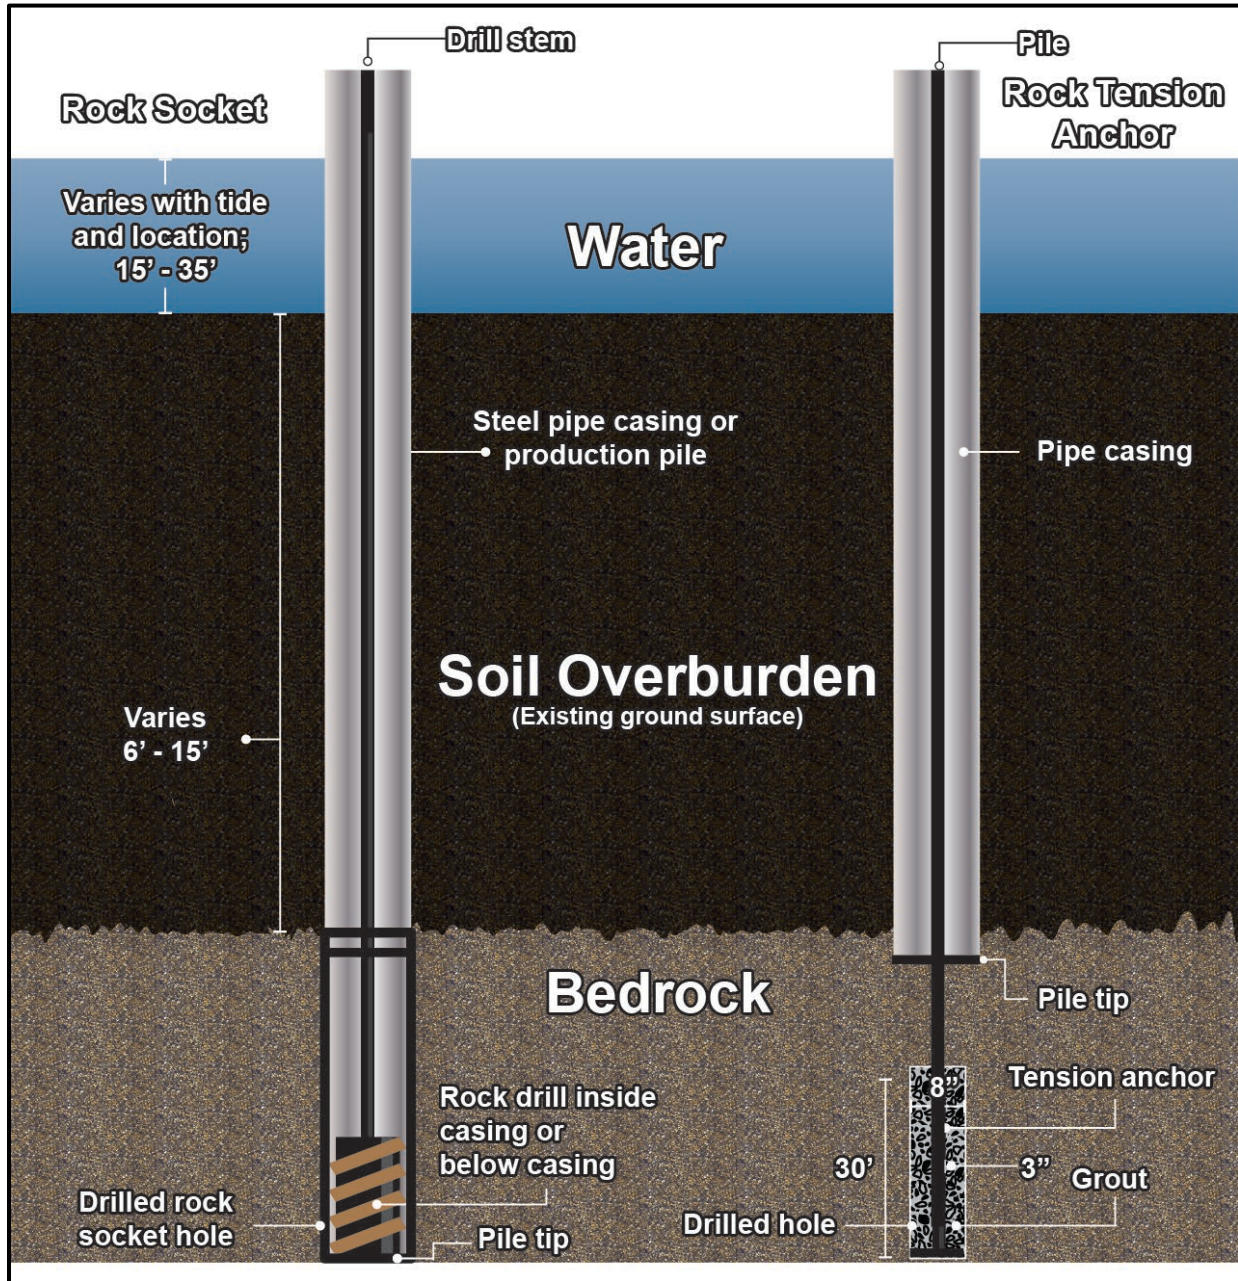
Schematic of DTH Pile Installation Method and Tension Anchor Installation
